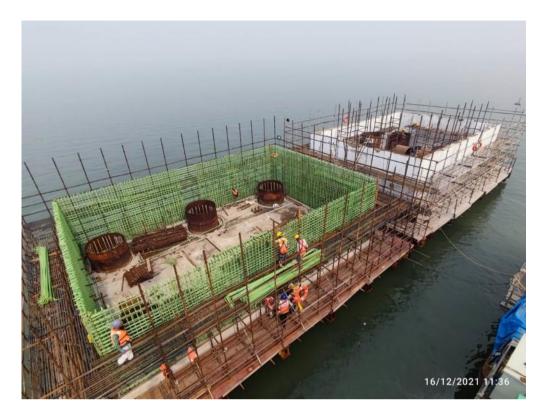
PC Shell wall reinforcement tying at MP 185 RHS in progress
